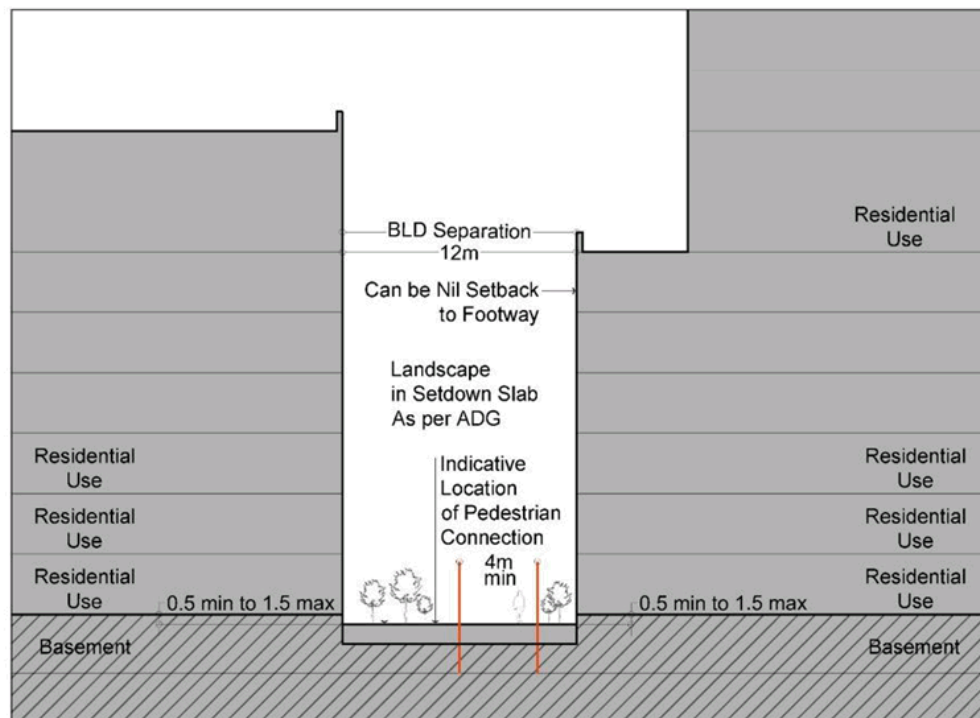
Street Wall Height at Pedestrian Connection, NTS
